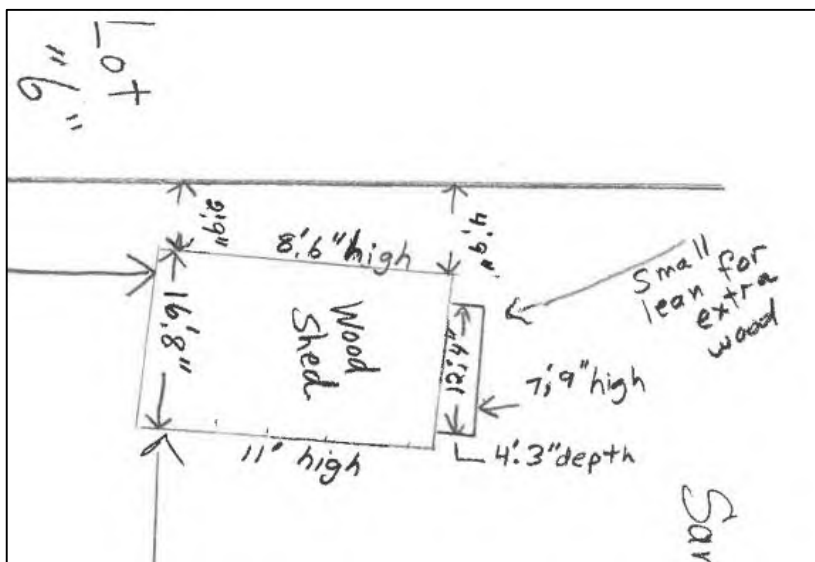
Site Plan Excerpt of Wood Shed – Prepared by Applicant
